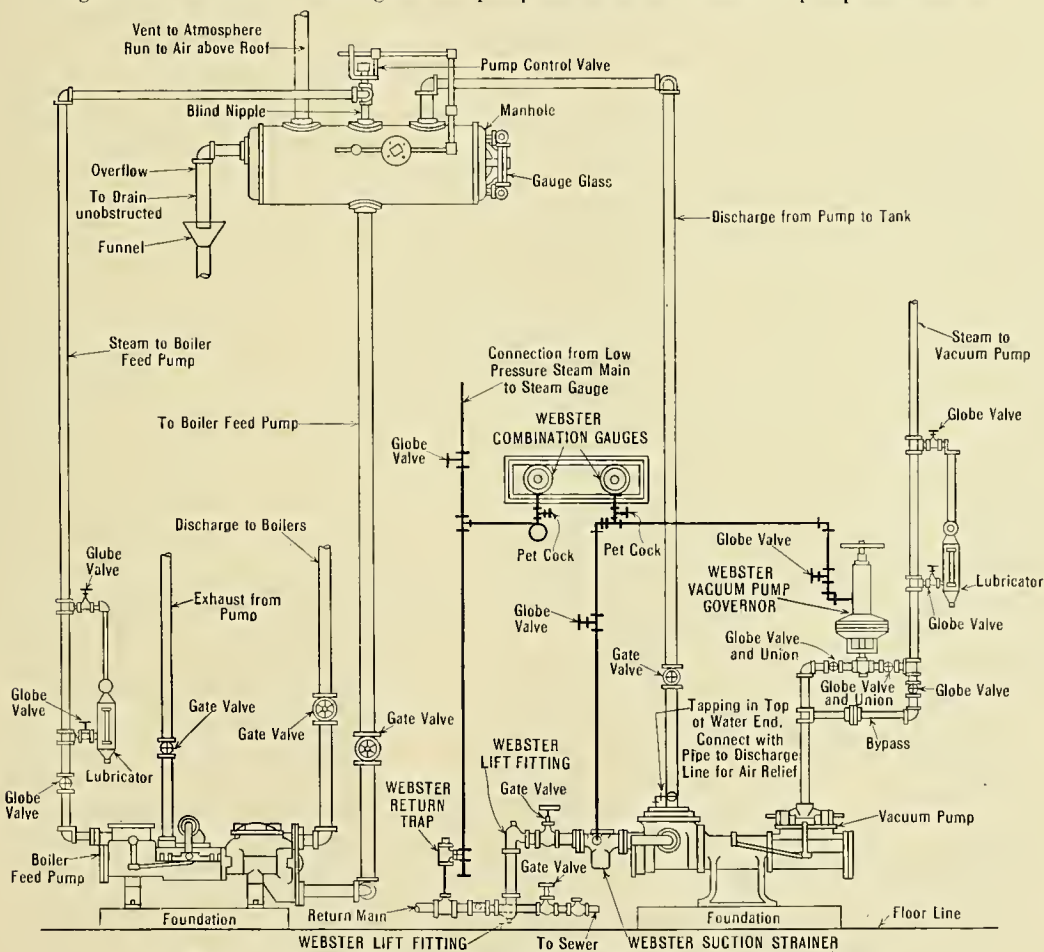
Method of connecting vacuum pump, boiler-feed pump and Webster Steam-control Receiving Tank
